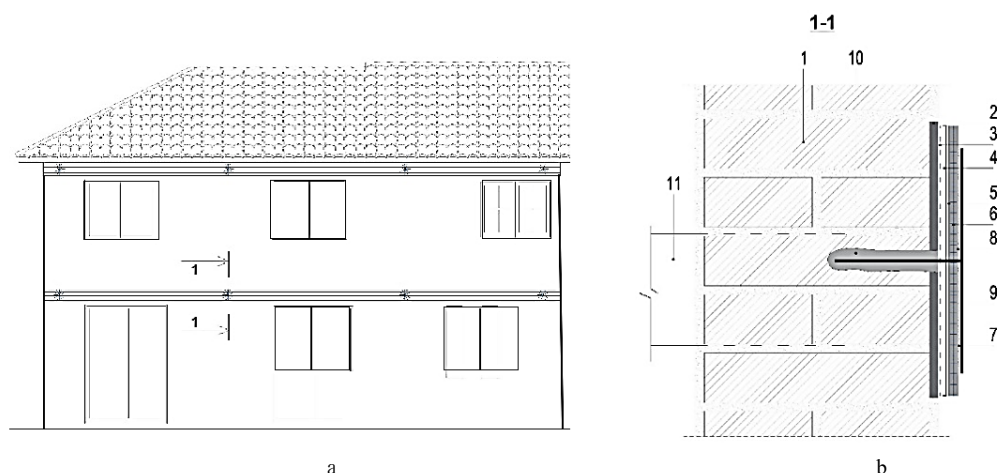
Design solution for the arrangement of inter-floor belts for wall reinforcement (according to MAPEY LLC technology [9] or analogues): a – facade of the building with possible placement of belts; b – section 1-1, where: 1 – wall; 2 – repair solution; 3 – primer; 4 – epoxy-based putty; 5, 8 – solution for fabric impregnation; 6 – carbon fabric; 7 – quartz sand; 9 – anchor cord; 10 – anchoring solution; 11 - overlapping
